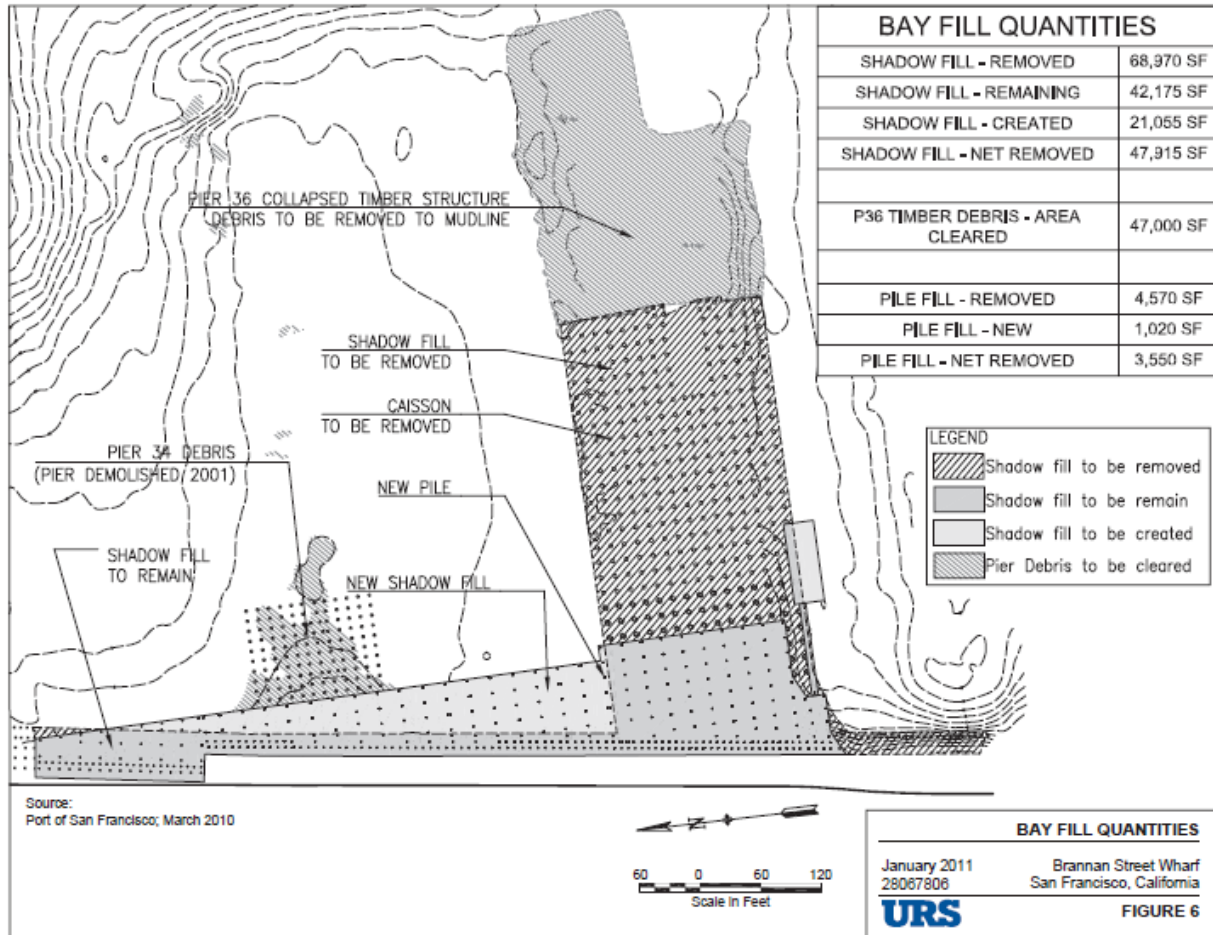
Proposed Pier 36 / Brannan St. Wharf Demolition and Construction
